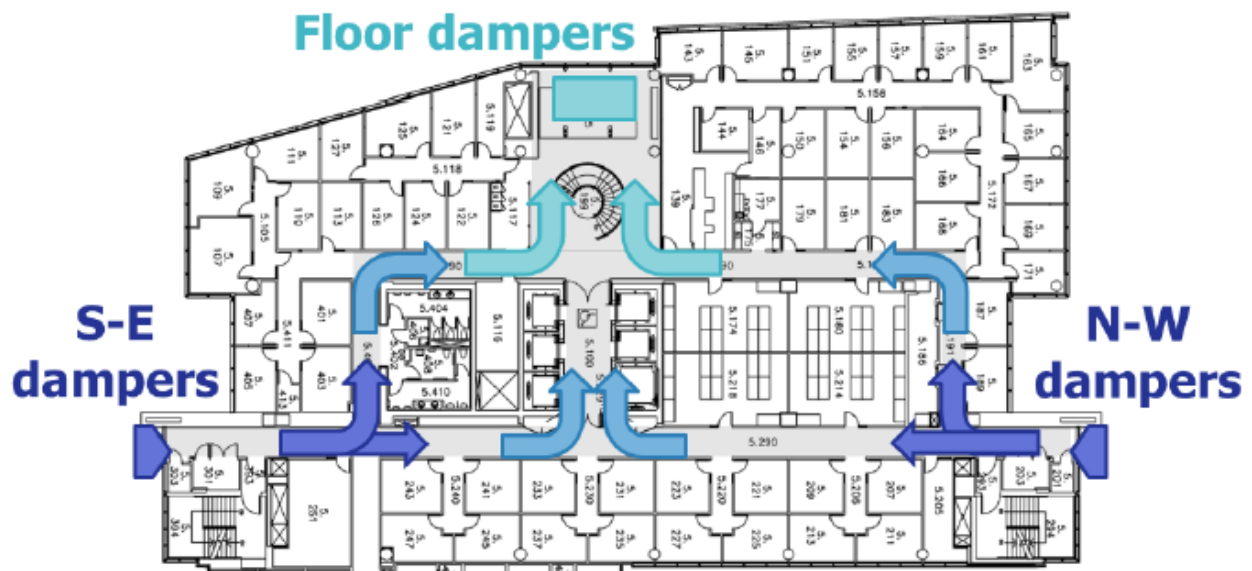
Typical floor plan in EV building and expected airflow path [8]
